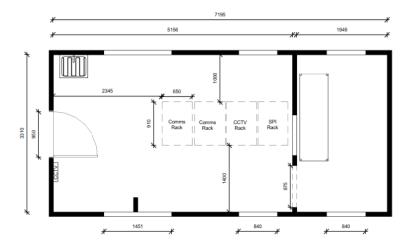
Existing and proposed floor plan of SSE room (Gartner Rose/Transport)
